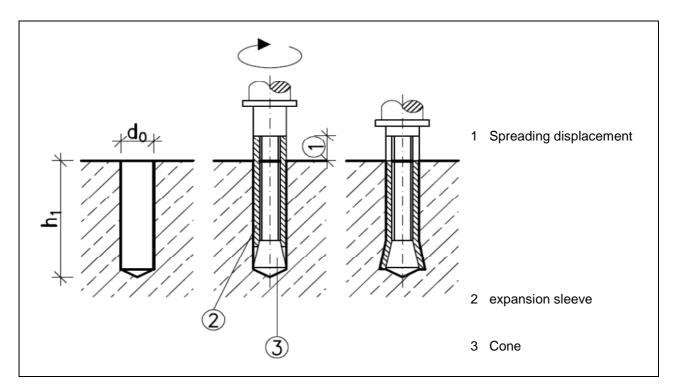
Fastener installation by rotating the fastener sleeve, e.g. by means of the drilling machine; thereby undercutting the concrete and forcing the sleeve over the cone. To facilitate the undercutting, the end of the fastener sleeve can be specially designed (e.g. with cutting pins)
